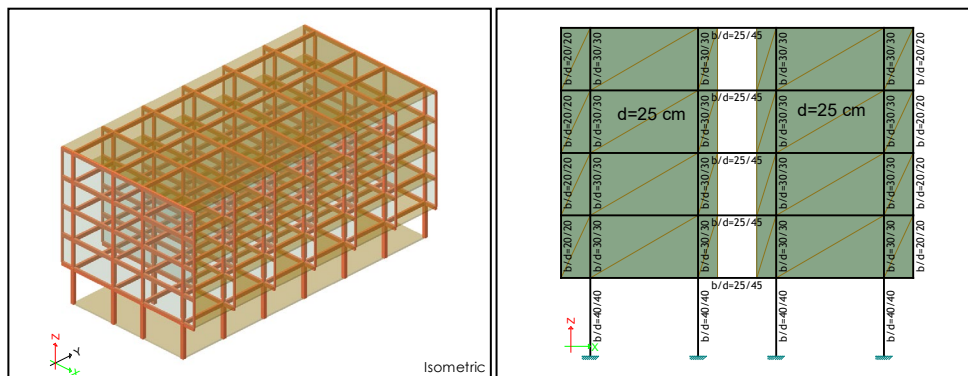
a) Calculation 3D model of the building structure; b) Section frame for model Ma. Diagrams by authors (Radimpex Tower 8).
